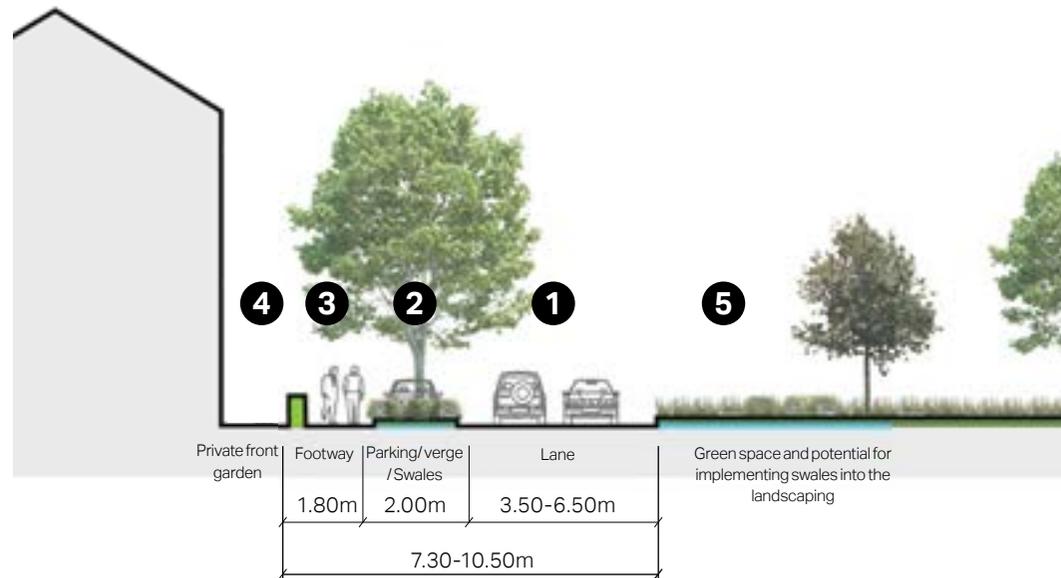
Section showing indicative dimensions for mews. The mews width may vary to discourage speeding or provide space for parking.
